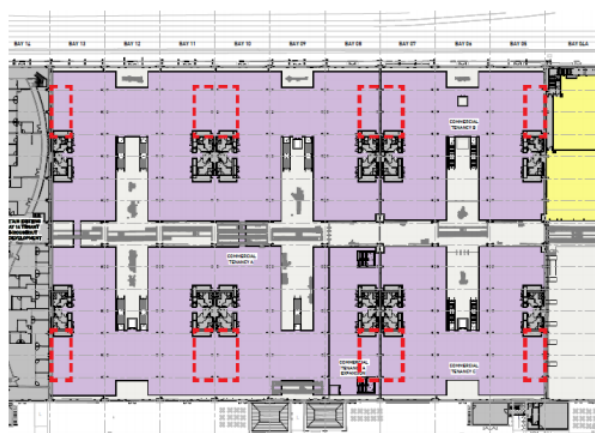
| Proposed and approved (shown in red) location of service pods – First Floor (Source: Applicant)
